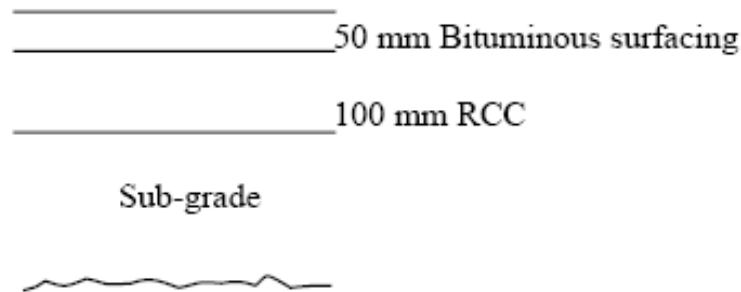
Layout of trial construction layers at Lowdham Grange site.
